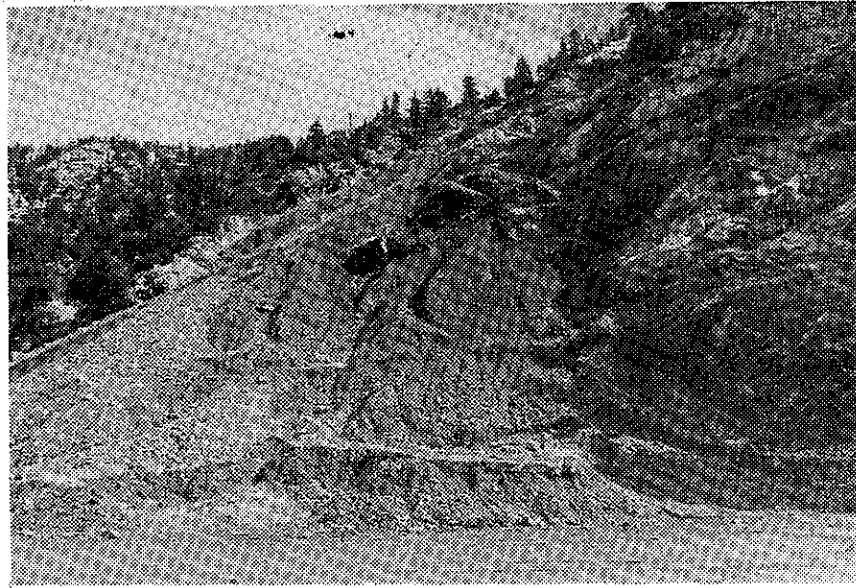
Continuous Accumulation of Slide Debris Behind Wall
